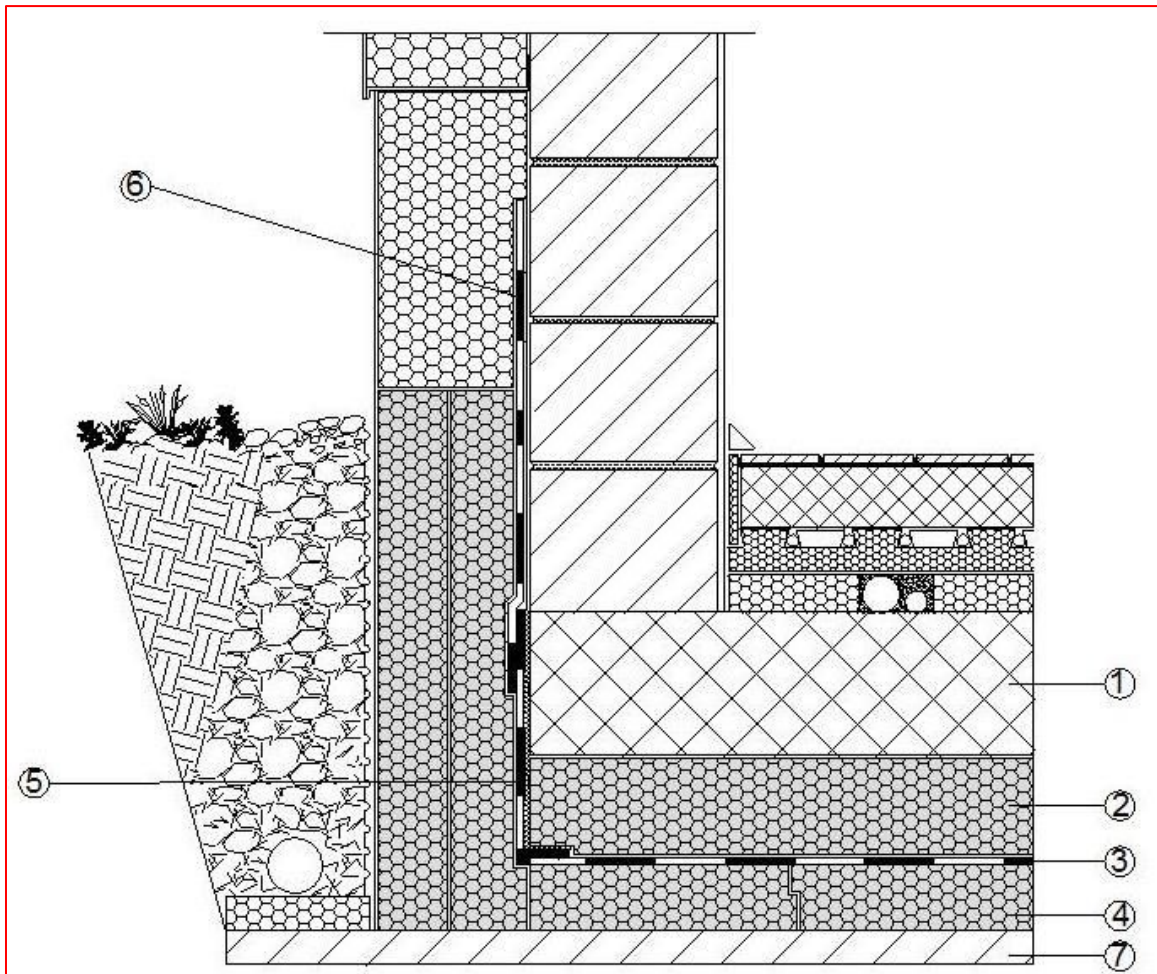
Fragmat Hydroproof MT manufacturer drawing
